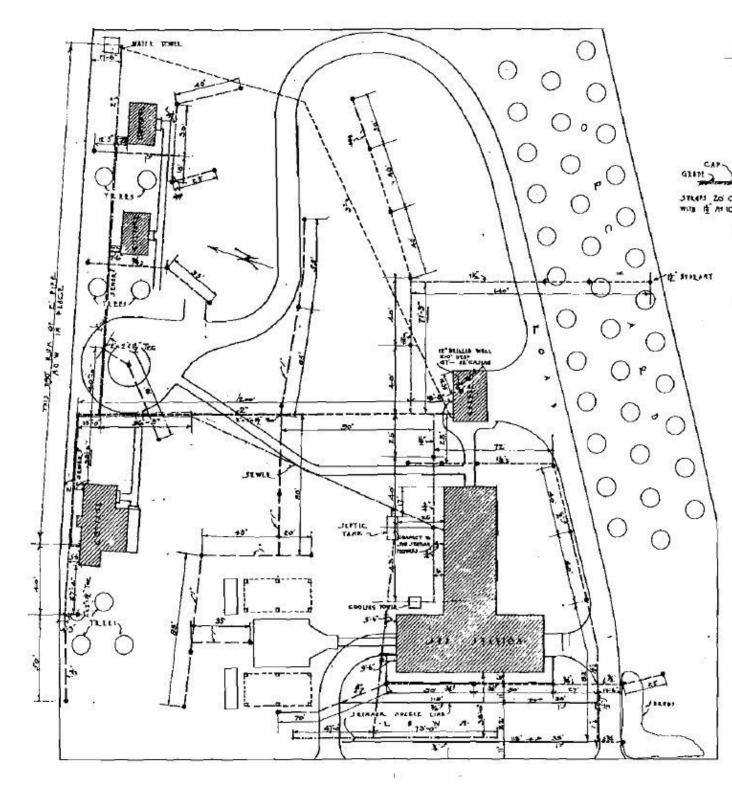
Plot plan detail showing substation, outdoor equipment, and ancillary buildings, 1918.
